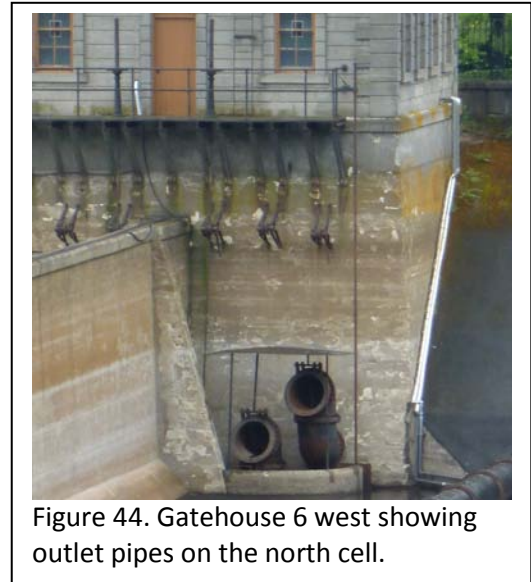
Gatehouse 6 west showing outlet pipes on the north cell.
